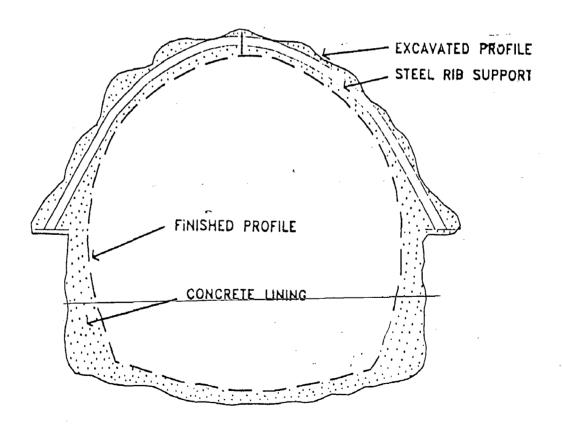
SECTION OF SALAL HYDEL PROJECT TAIL RACE TUNNEL SHOWING RIB SUPPORT
